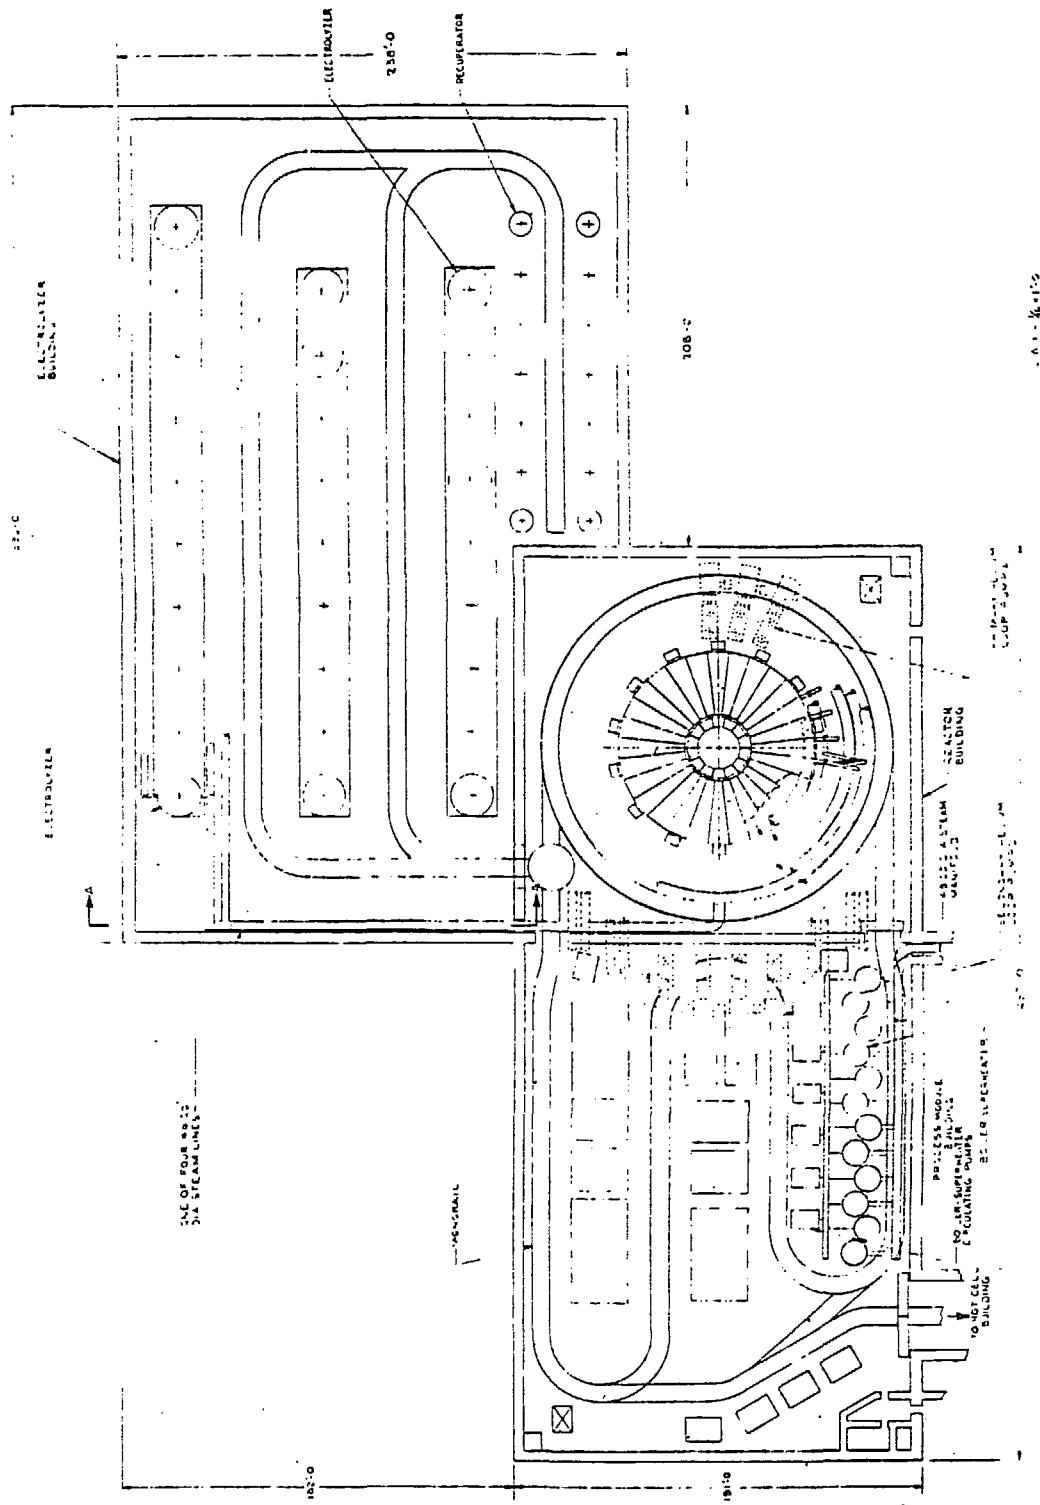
Hyfire Tokamak Reactor Building Plan
